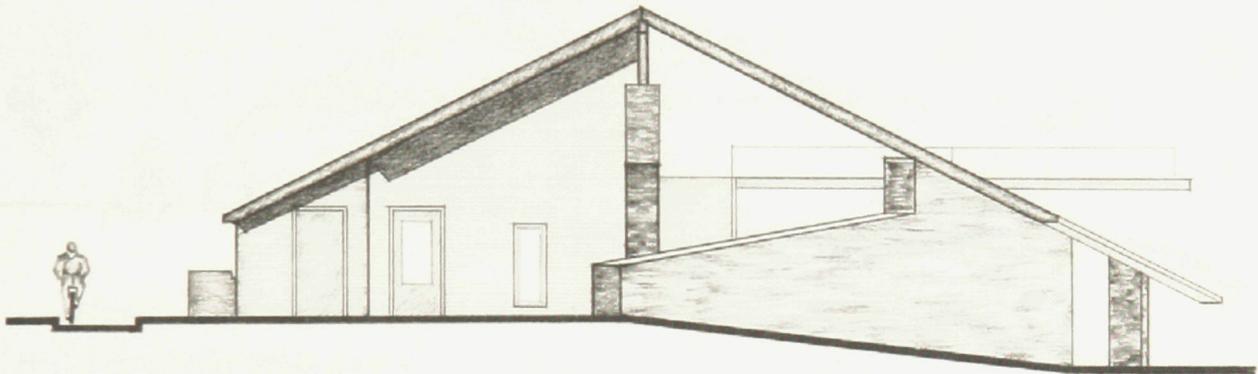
Pavilion: West Elevation*, graphite, original 8" x 14" @ 1:100, 2008. Created by author.
